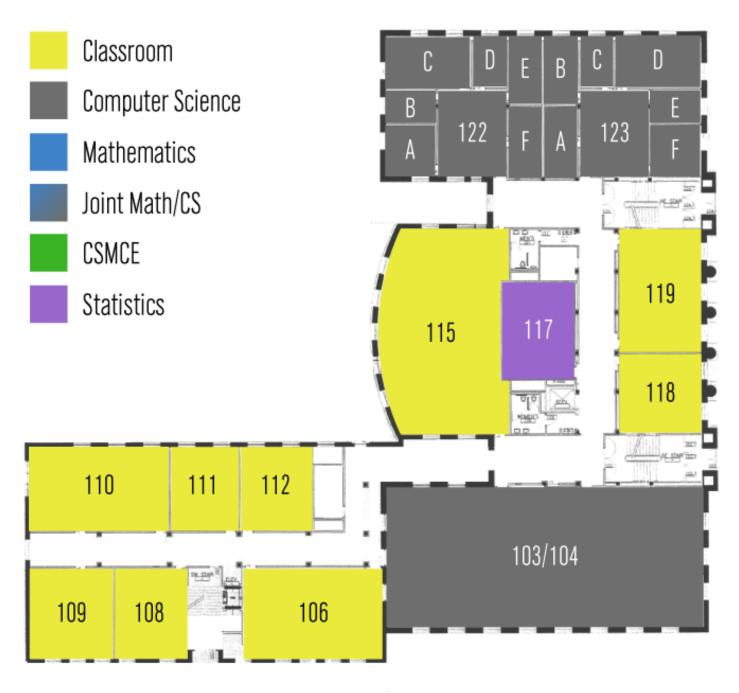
Floorplan of 1^{st} Floor of Avery Hall
